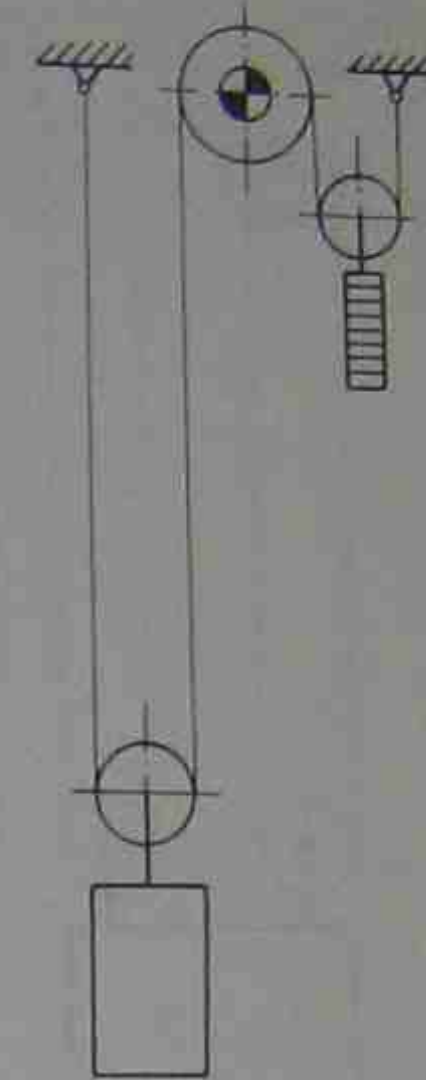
Roping system for overhead position of the machine, single wrap drive, roping factor 2.
